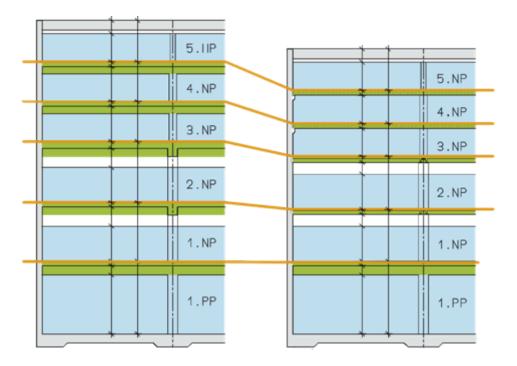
Height and building envelope difference between a slim floor structure and conventional structure
